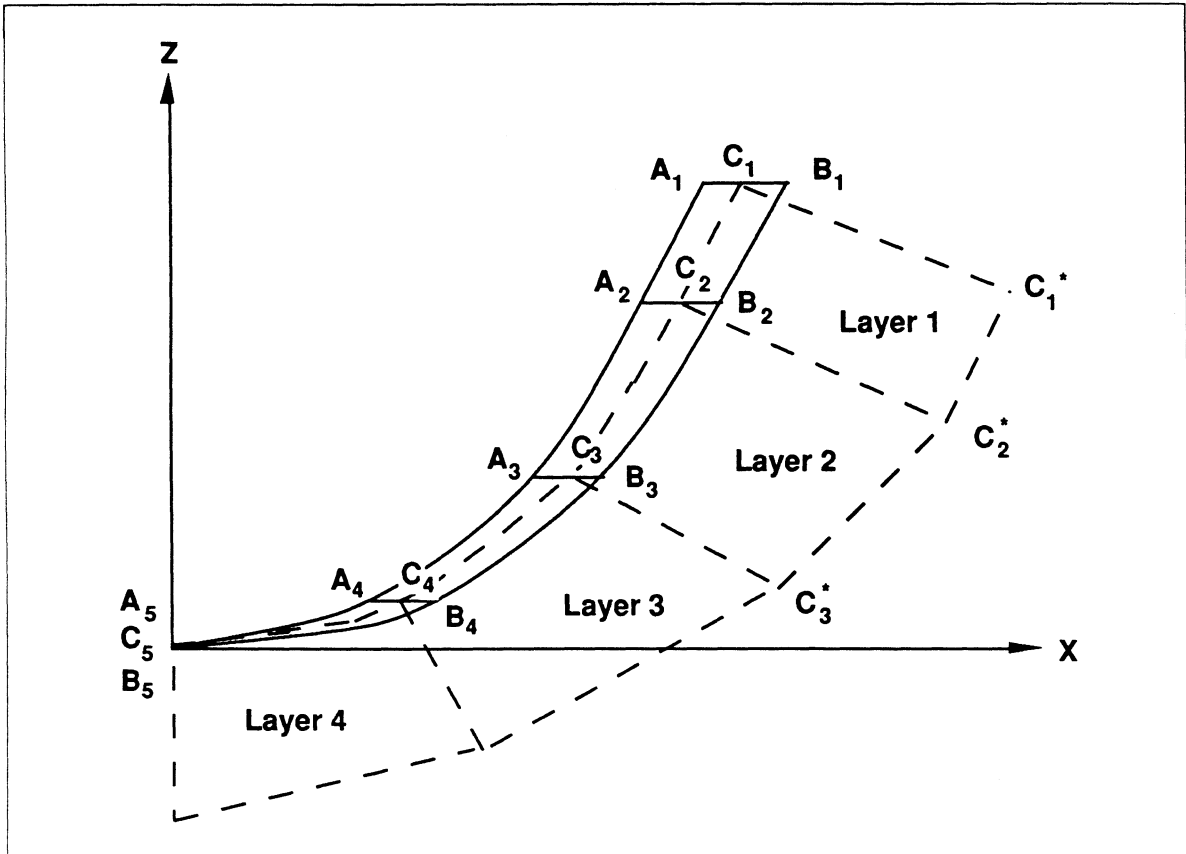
Projection of Abutment and Foundation Model on X-Z Plane
